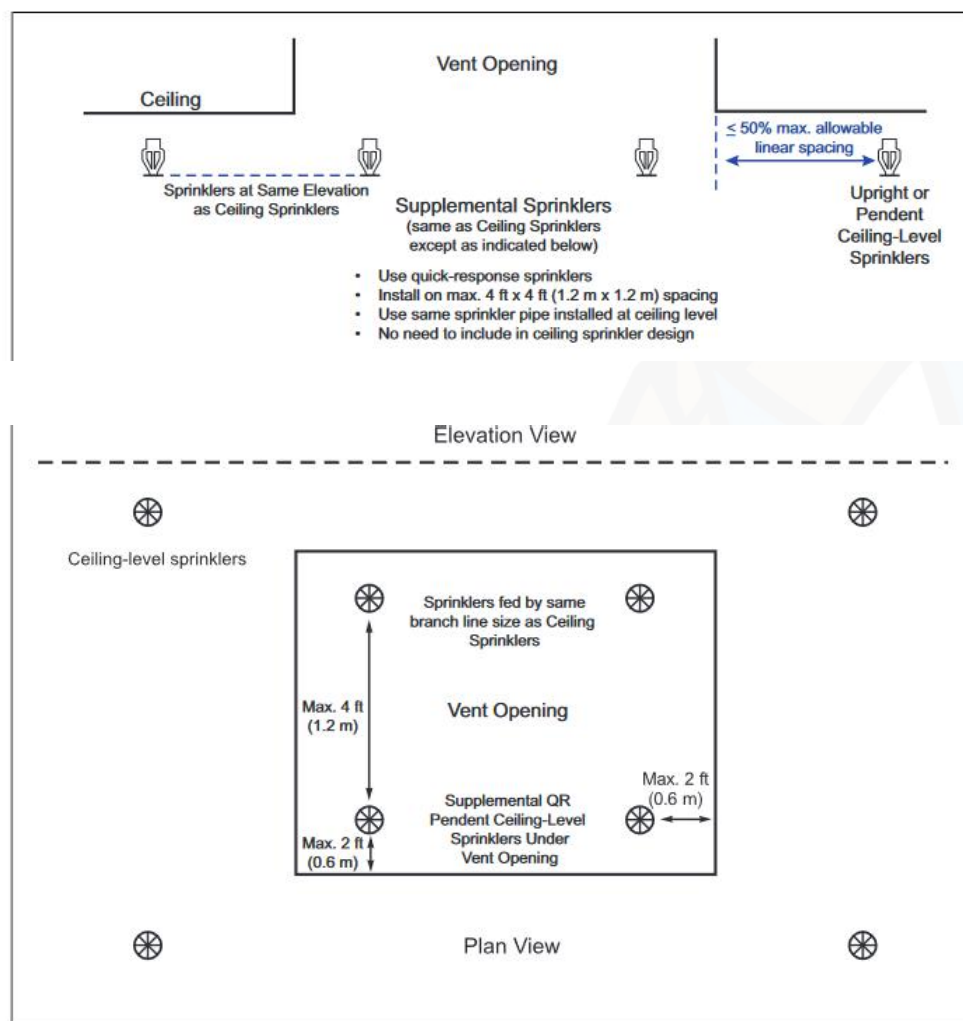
(c). Protection of openings at ceiling level, such as heat vents, smoke vents, powered or natural draft exhaust vents, protected by quick-response supplemental sprinklers
